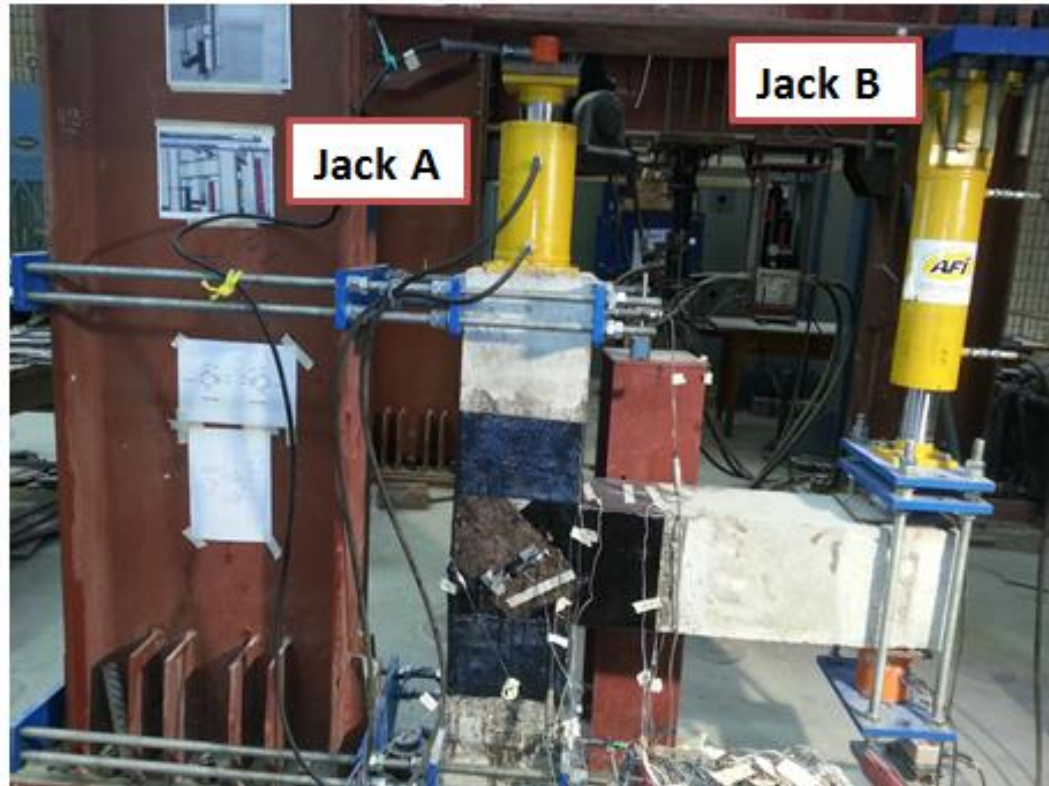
Hydraulic jacks used for testing of beam-column joints
